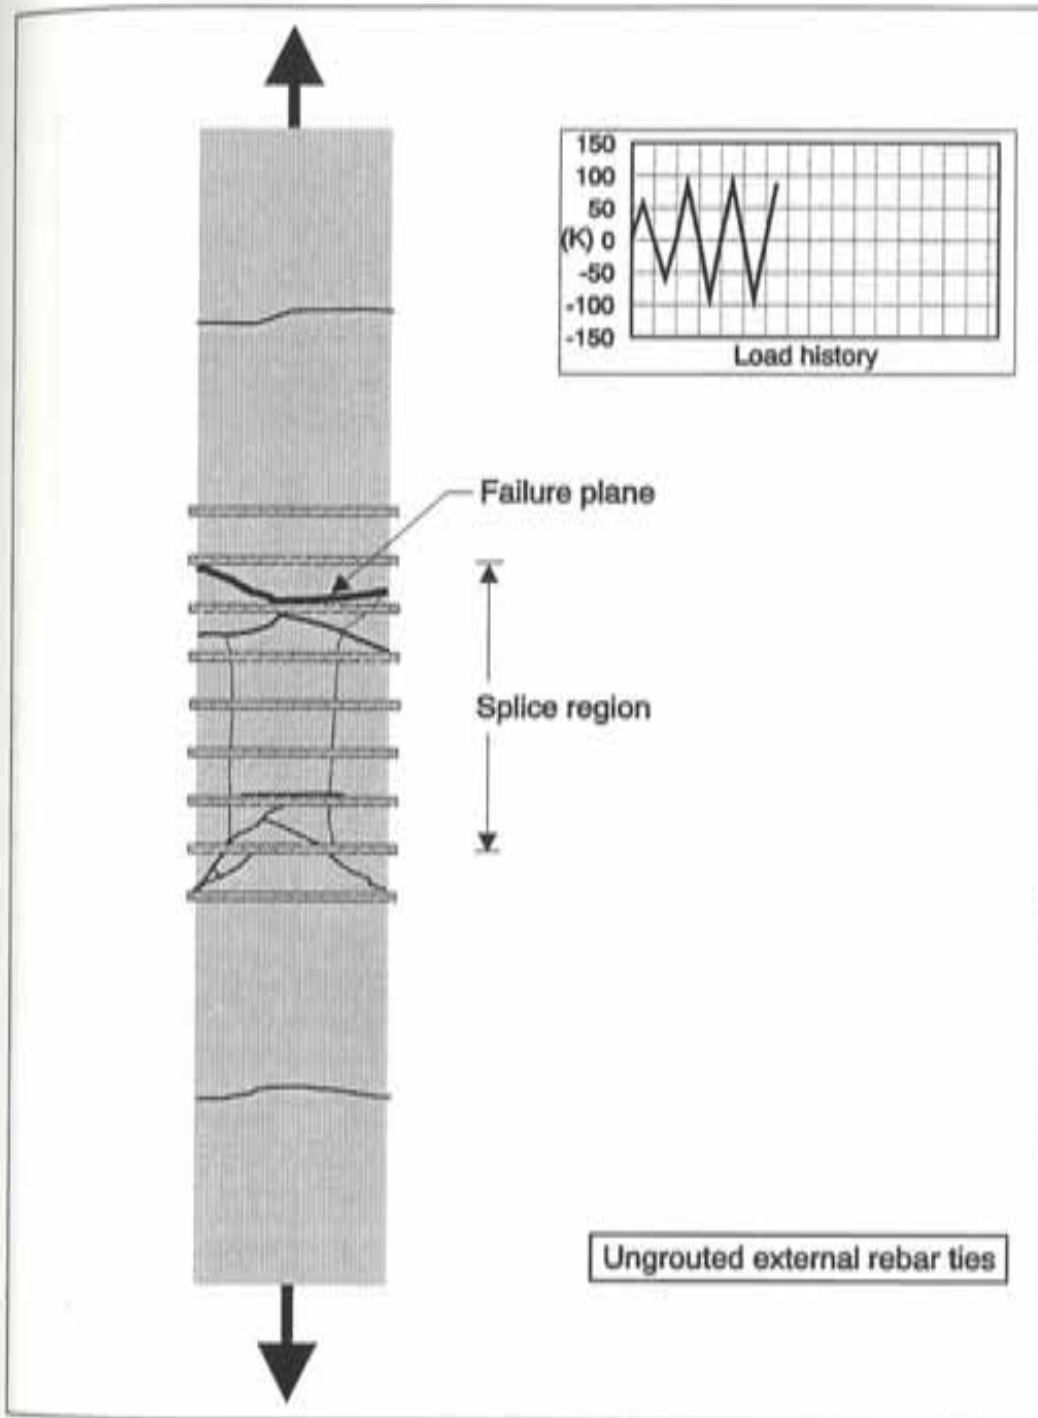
Crack pattern in specimen U-ES3-UG-2 at failure
